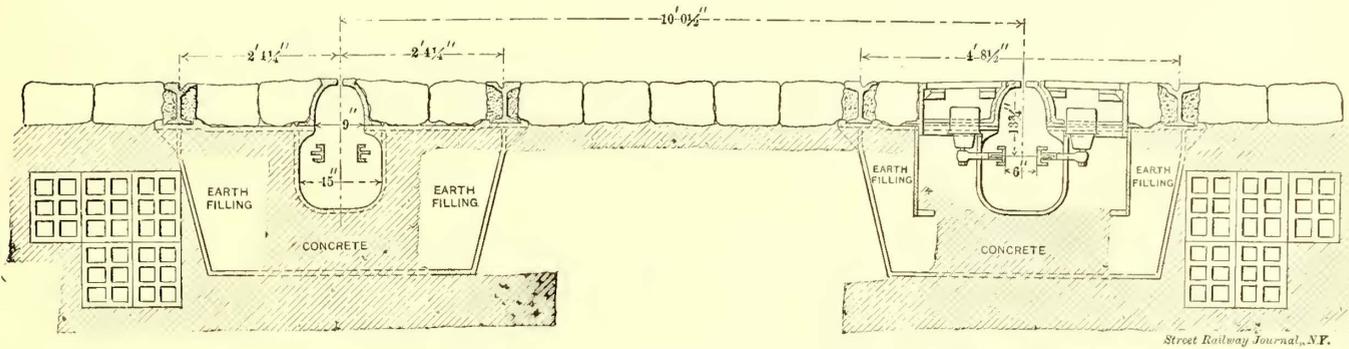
SECTION THROUGH ROADBED ON THIRD AVENUE
